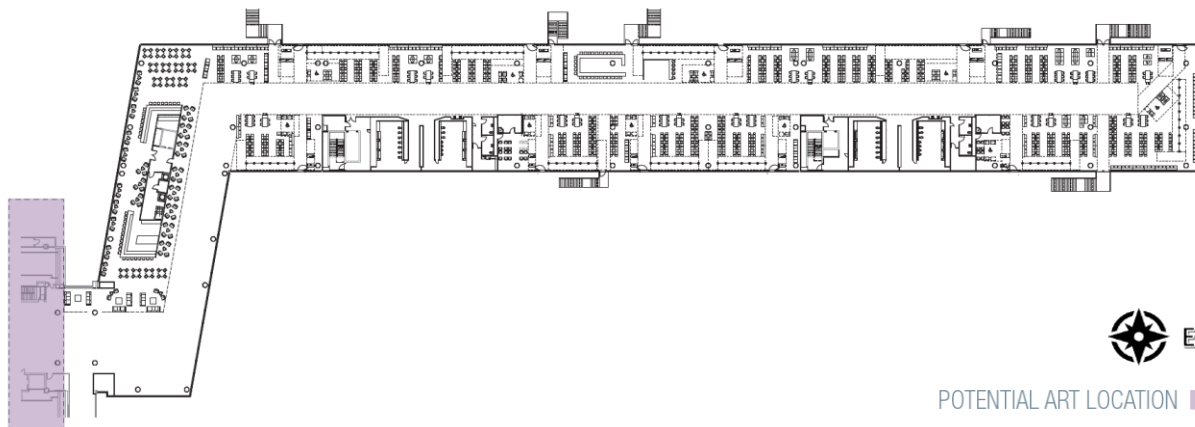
B-East Floor Plan, Ceiling View - Looking Down Towards Flooring: highlighted area illustrates possible artwork space
